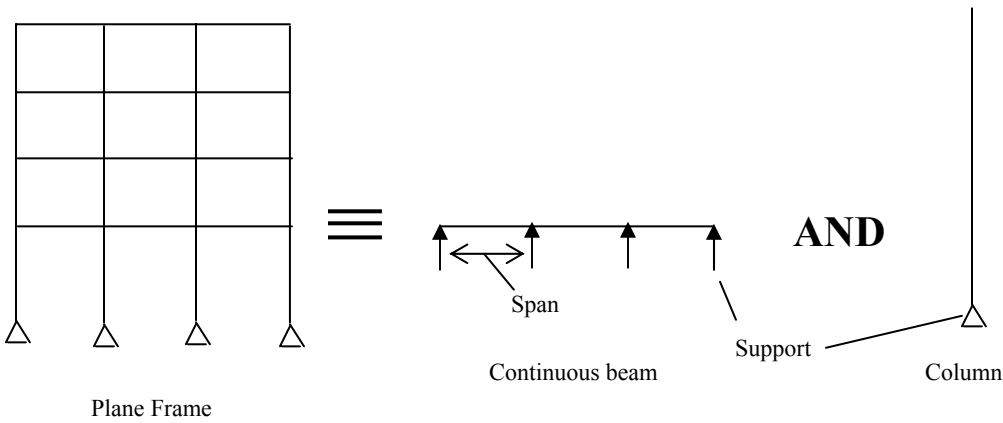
Idealizing a Plane Frame as Continuous Beams and Columns
